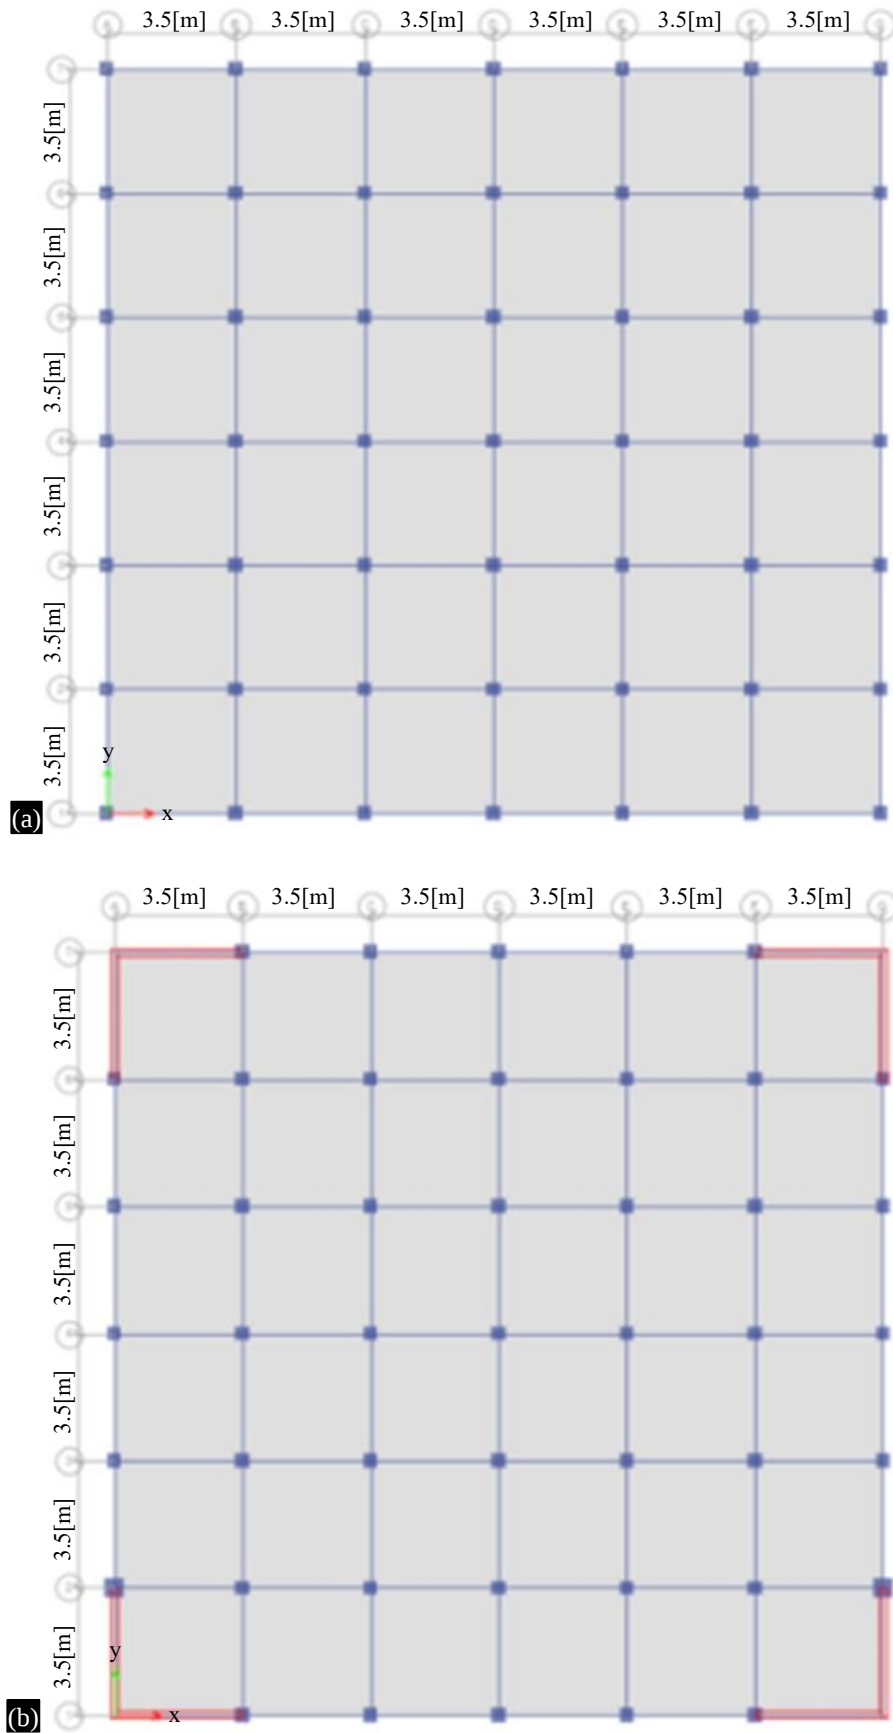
Plan view. (a) Without shear wall and (b) with shear wall.
